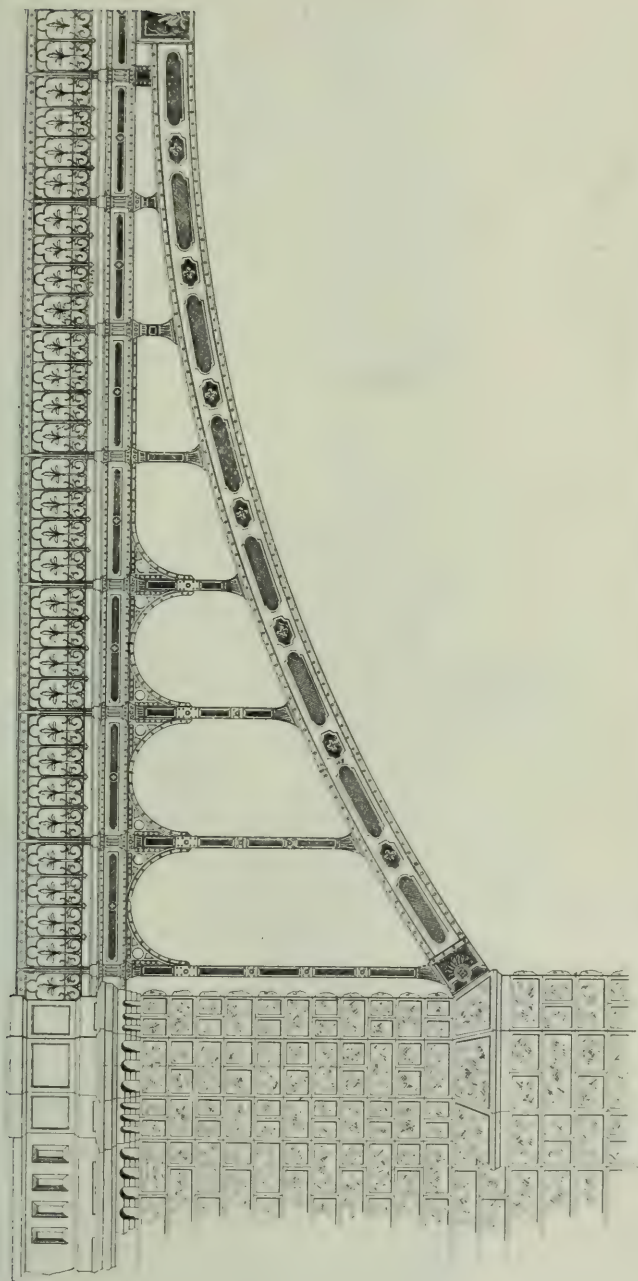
DETAIL ELEVATION OF OUTER RIB FOR TWO 87-FOOT STEEL ARCH BRIDGES IN LAKE PARK.
